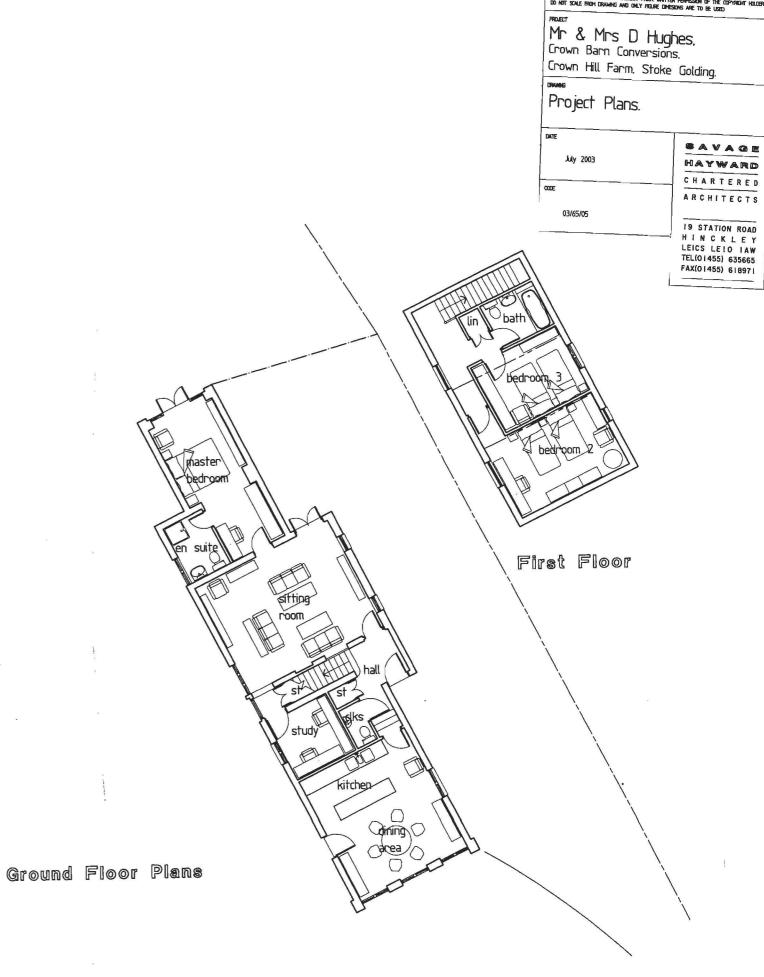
Elevation and Floor plan drawings of Barns 1-4 as proposed. Taken from plans supplied by the developer (not to scale).
